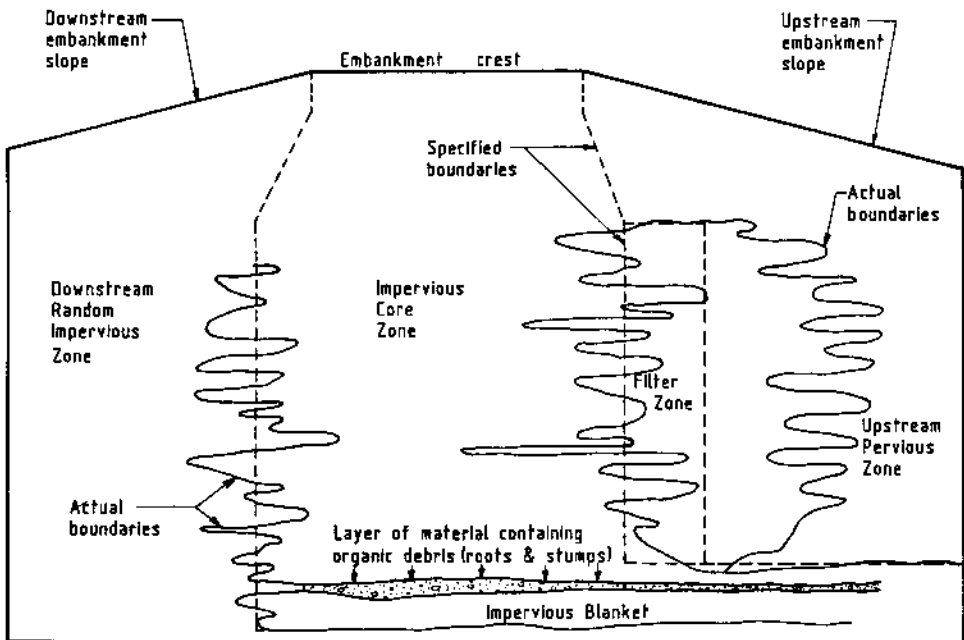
Embankment section of a dam with poor control of zoning boundaries during construction (Pritchett 1985).
